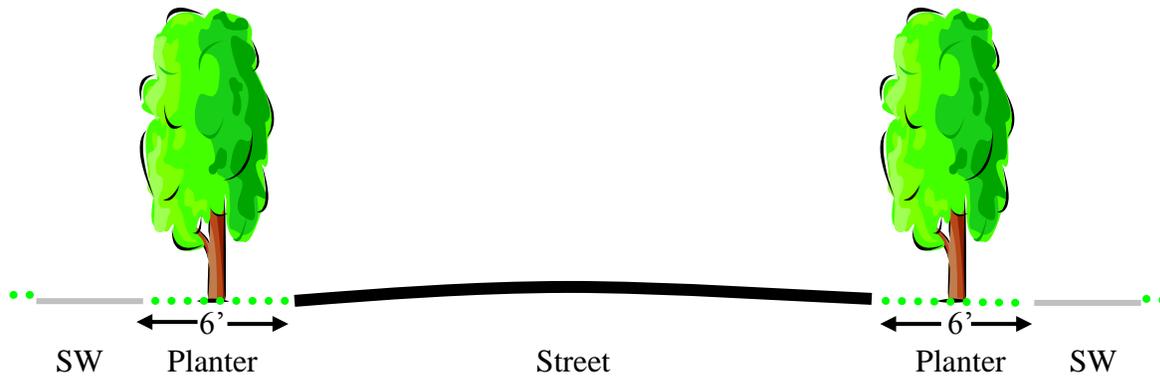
If space does not allow for 8' wide planter strips, then 6' can still be planted with medium to large street trees, however potential for root damage is higher.
